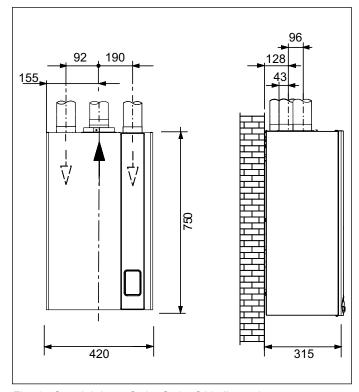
Coaxial ducts C43 - C53 - C83 dimensions
